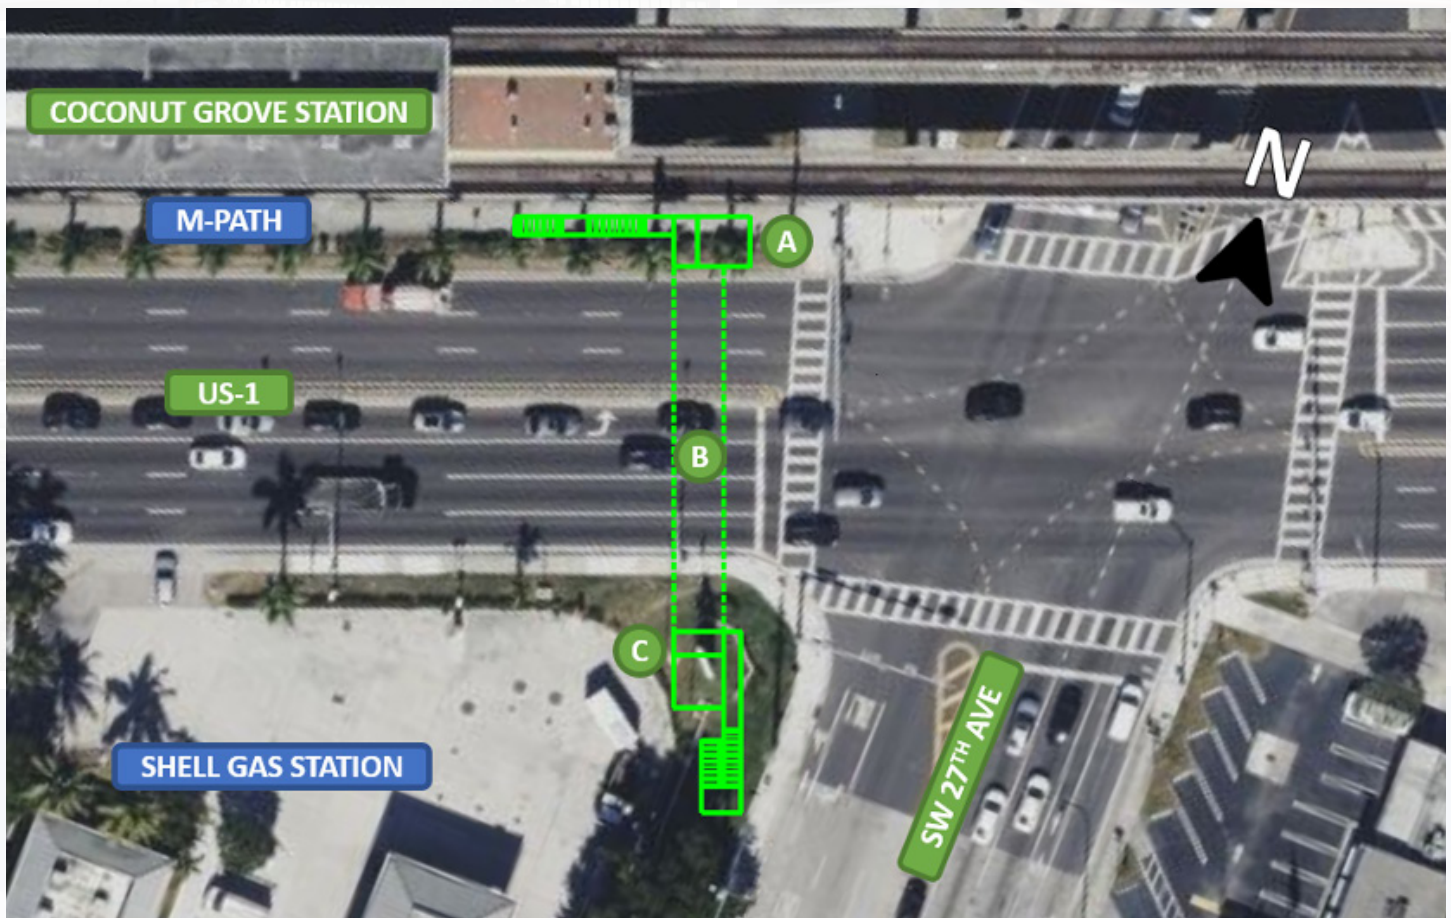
Coconut Grove Metrorail Station Alternative 1 Bridge Location
